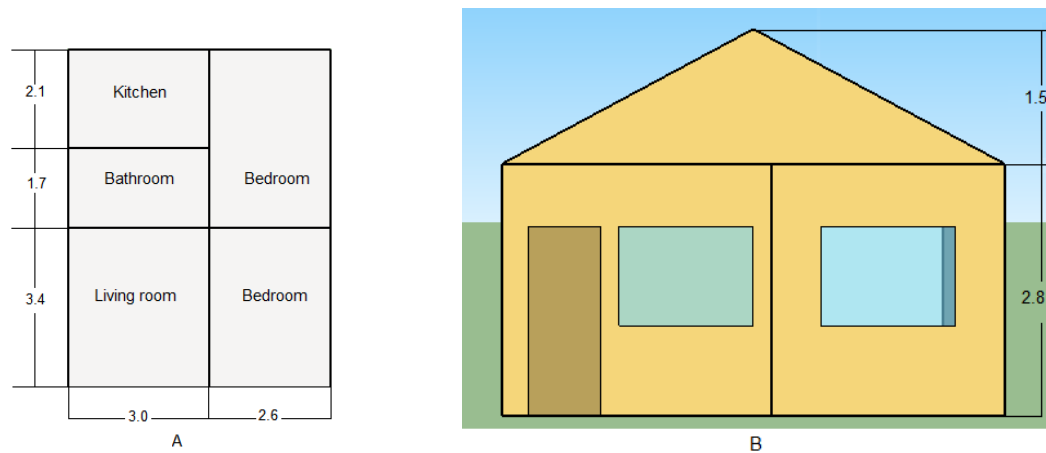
Plan (A) and elevation (B) of the building archetype (m)
